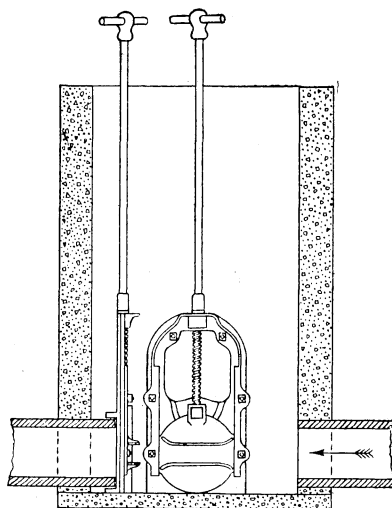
Combination standpipe and diversion box, built of concrete
